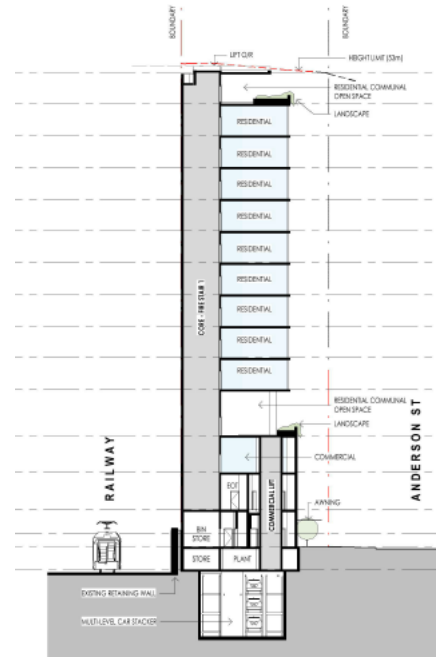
Proposed east-west section (source: Drew Dickson Architects)
